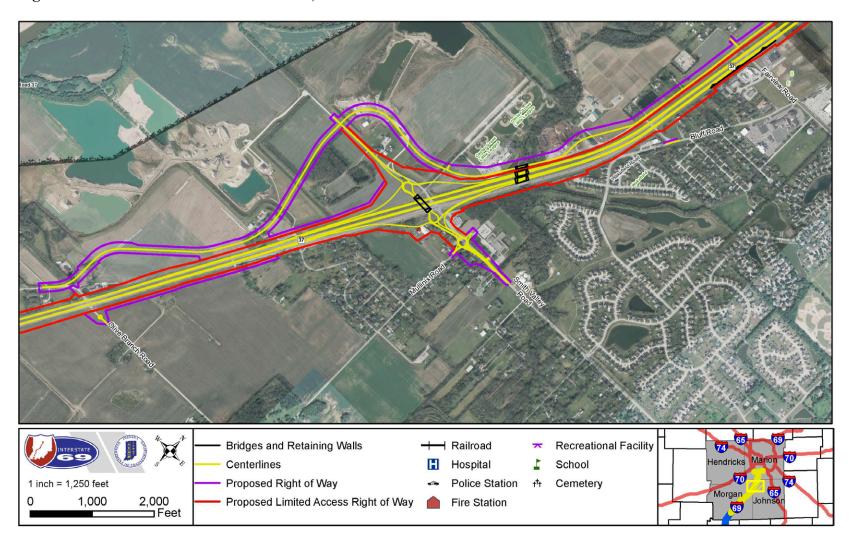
Refined Preferred Alternative, Olive Branch Road to Fairview Road
